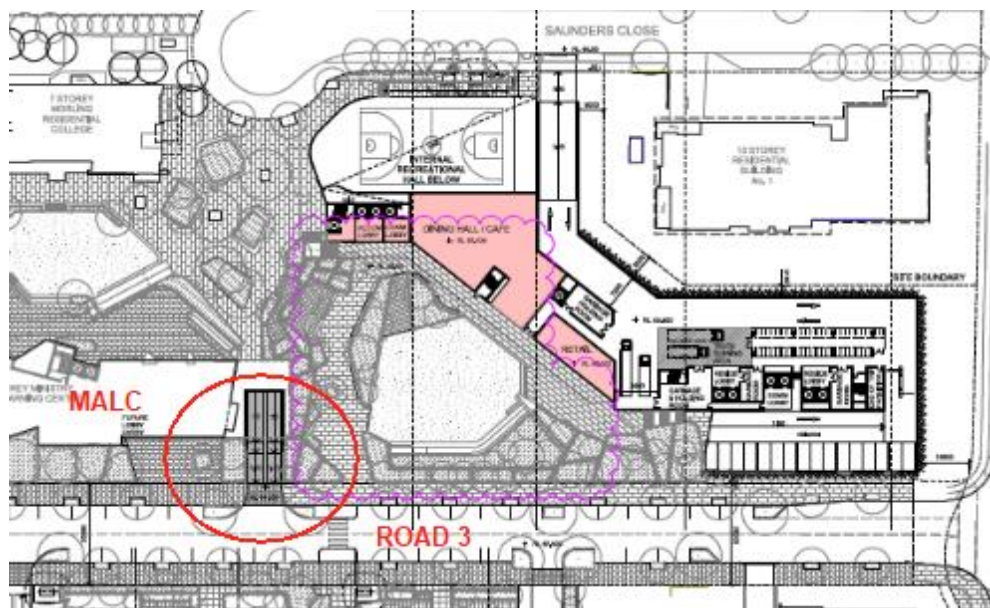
Approved access/egress to the MALC building and completed Road 3 (LDA2019/0264).
